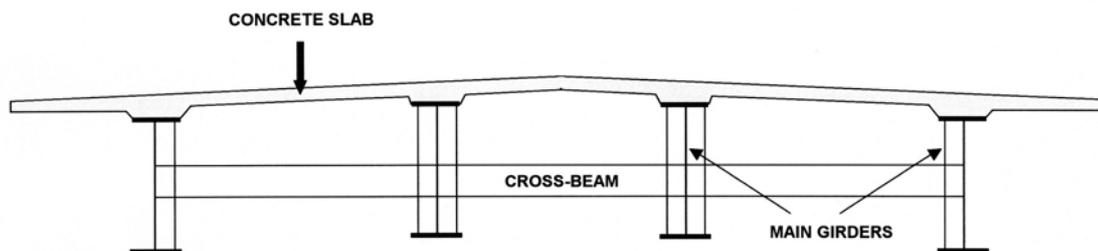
4-girder composite bridge (pavement bidirectional banking)
